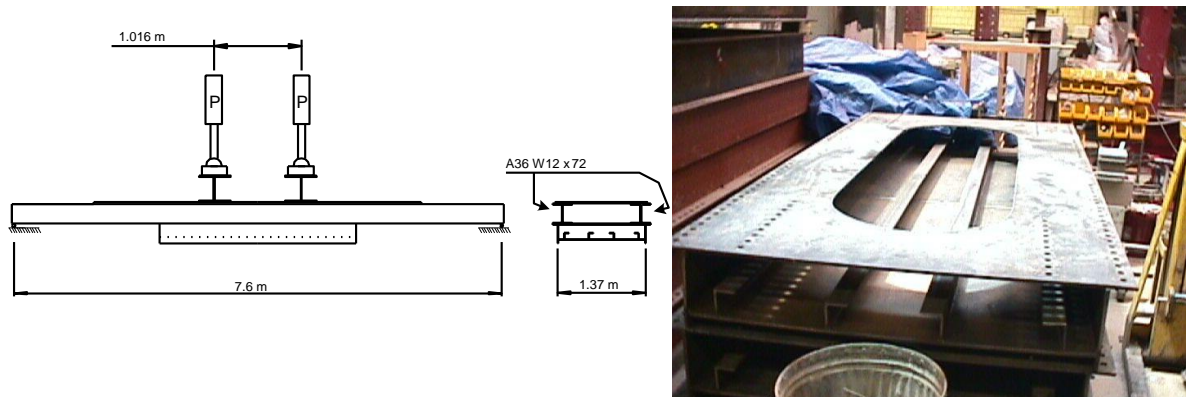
Four-point bending test fixture (left) and typical cross section of stiffened box-section (right)
